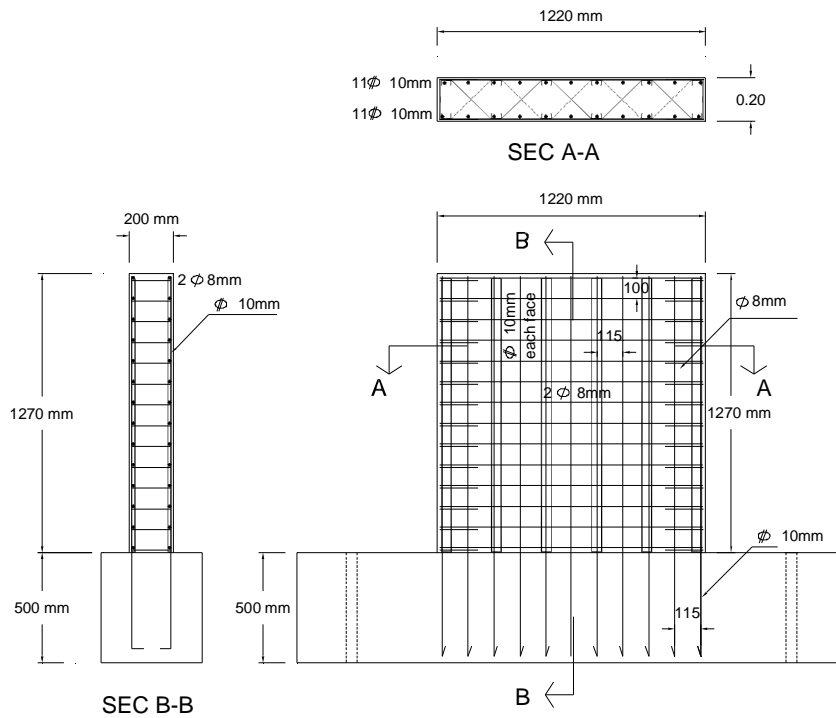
Reinforcement and Details of Specimen 3B.
